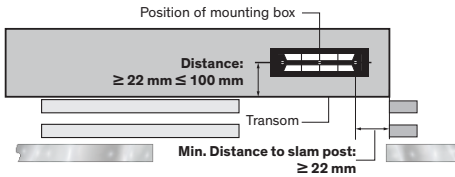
Position of the mounting box on the transom (left side-opening doors)
